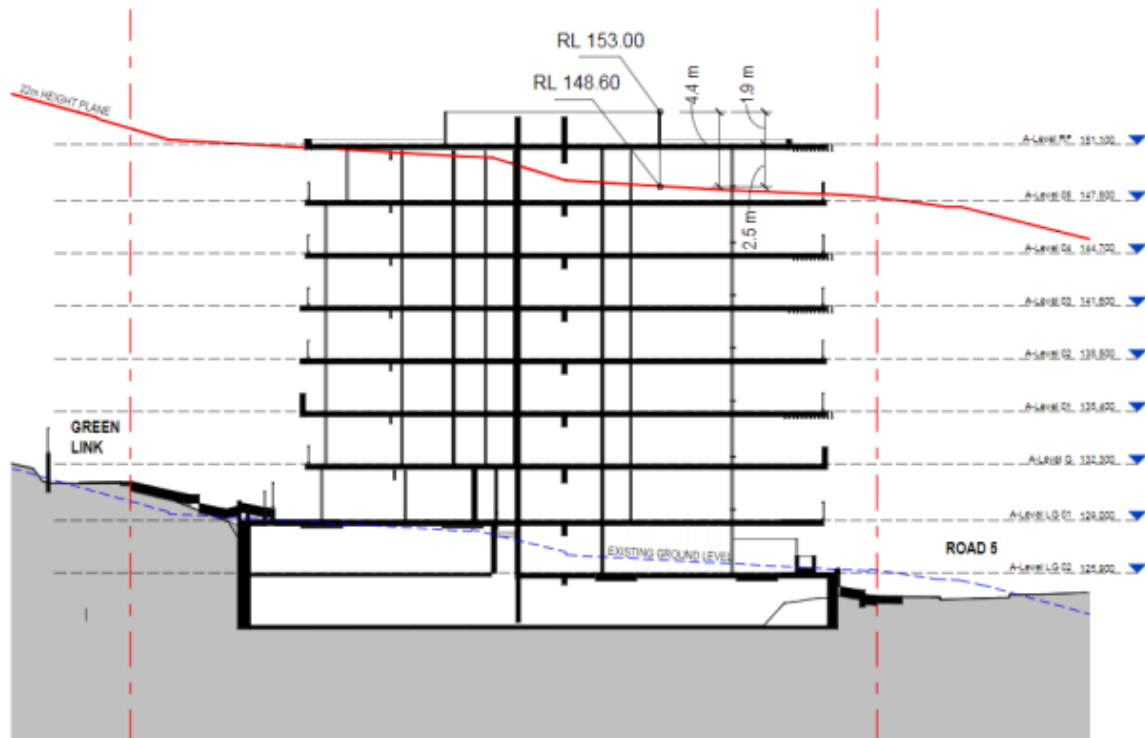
South Section of Building A showing the extent of height contravention (4.4m)
